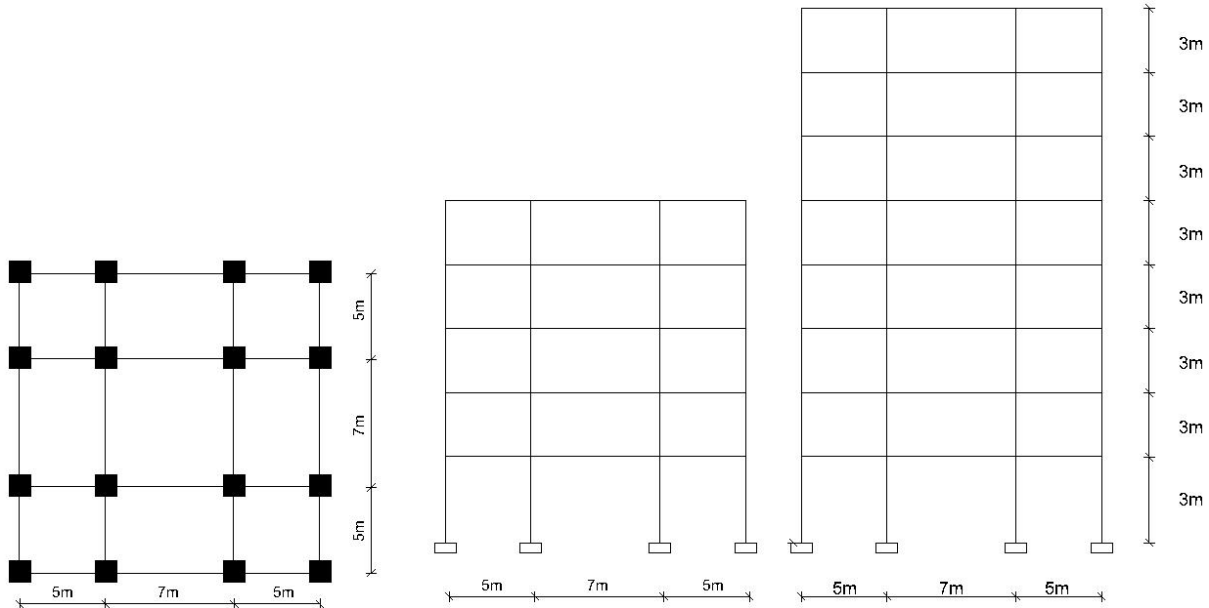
The plan view, the general layout and 3D view of structural SAP 2000 models
